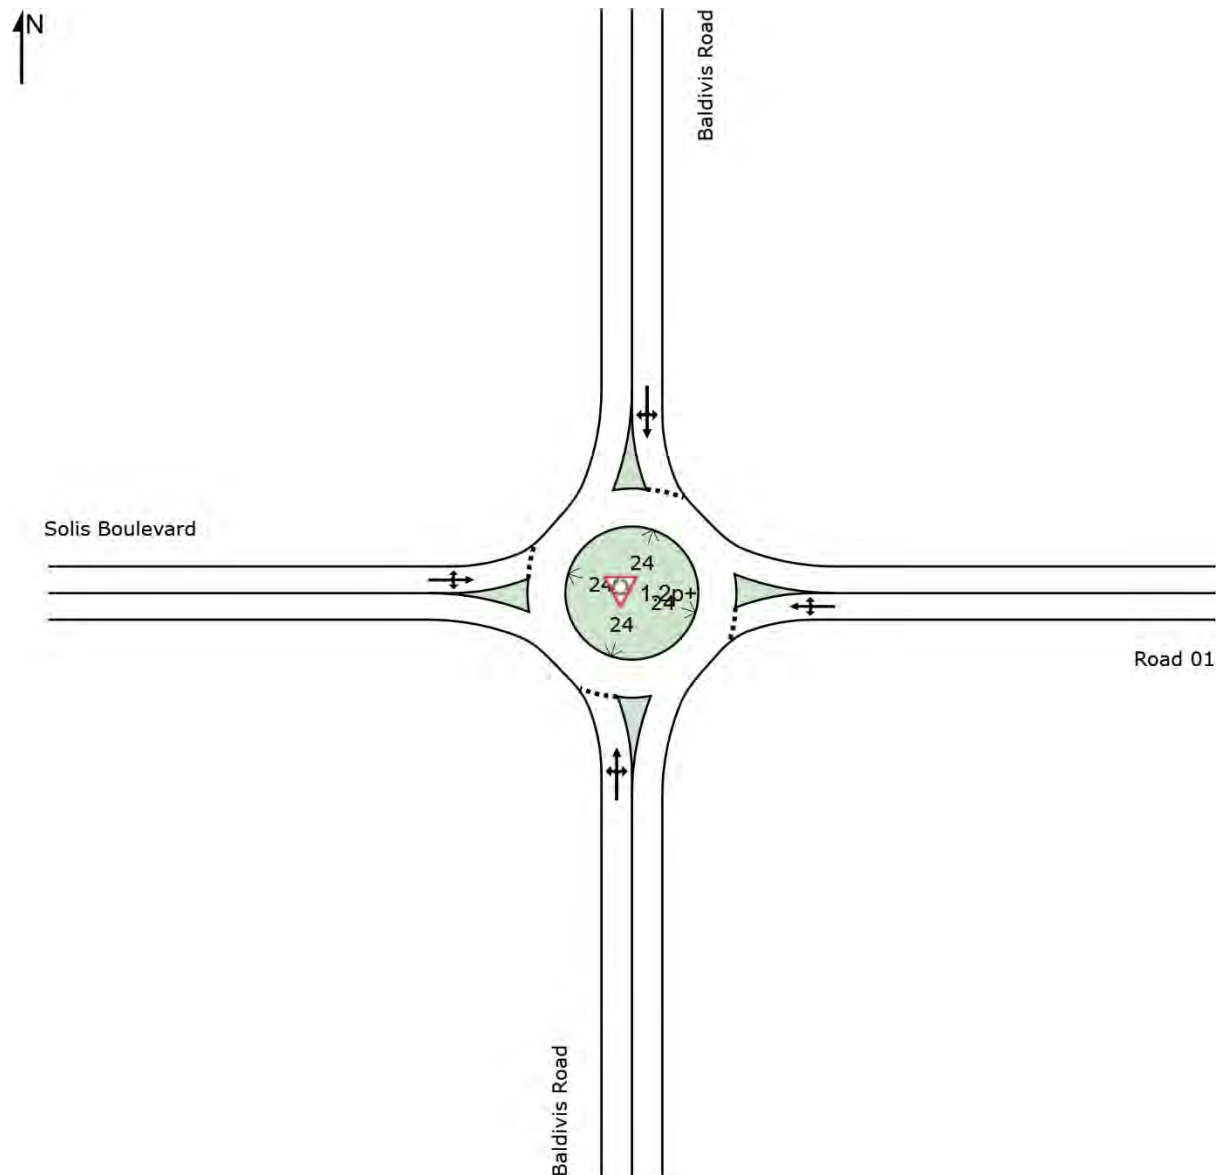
M02 Solis Boulevard / Road 01 / Baldvis Road – SIDRA Schematic Geometry
